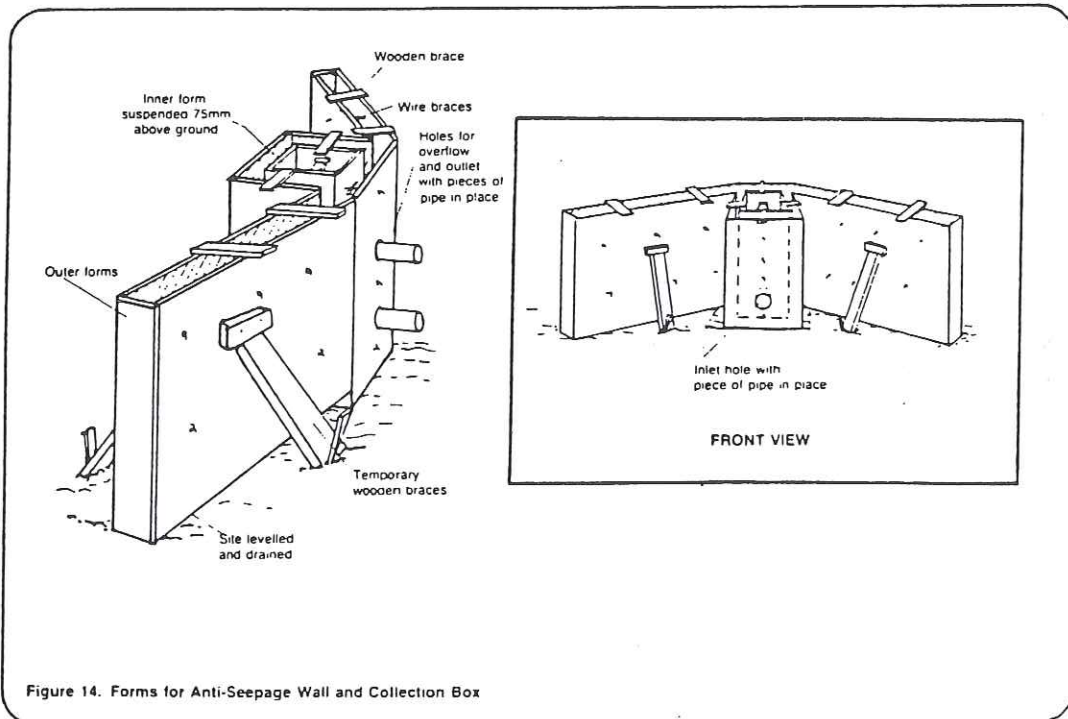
Forms for Anti-Seepage Wall and Collection Box
